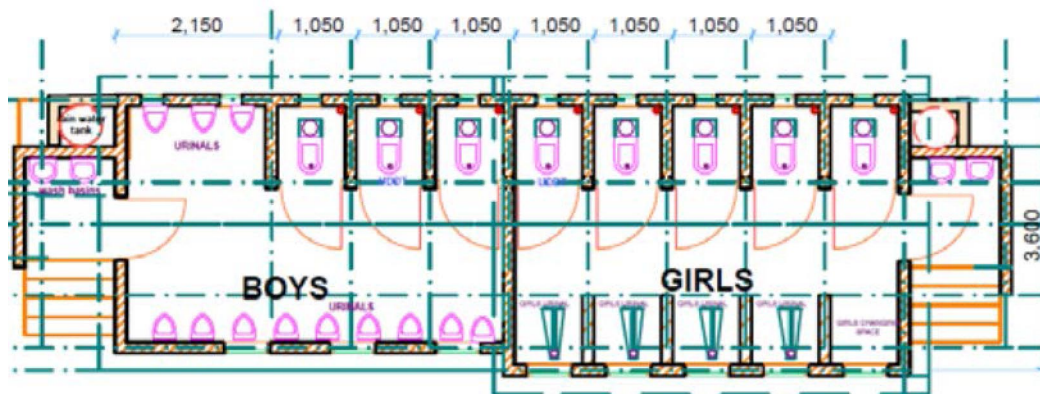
Floor plan for UDDT at Crater View Secondary School (ROSA Nakuru; 2009)
